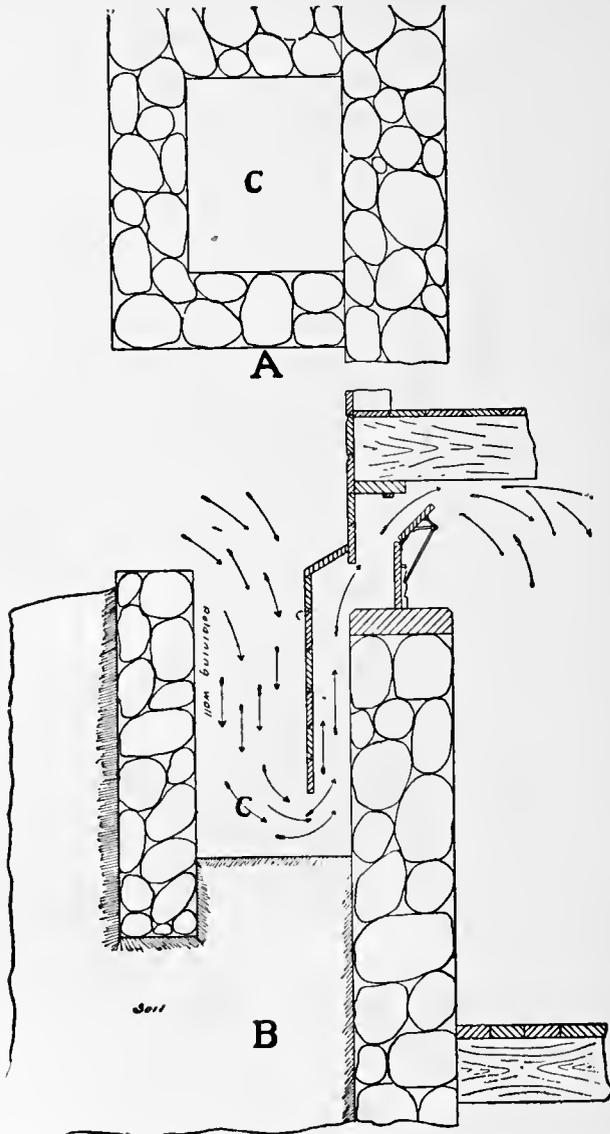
Method of constructing a fresh-air intake where the soil comes to or near the top of the wall, as found in many bank barns. Here an excavation is necessary. A cross section of the vertical opening or excavation C, is shown at A. The retaining wall prevents the soil from caving in. The area way is shown at C in cross section B.
